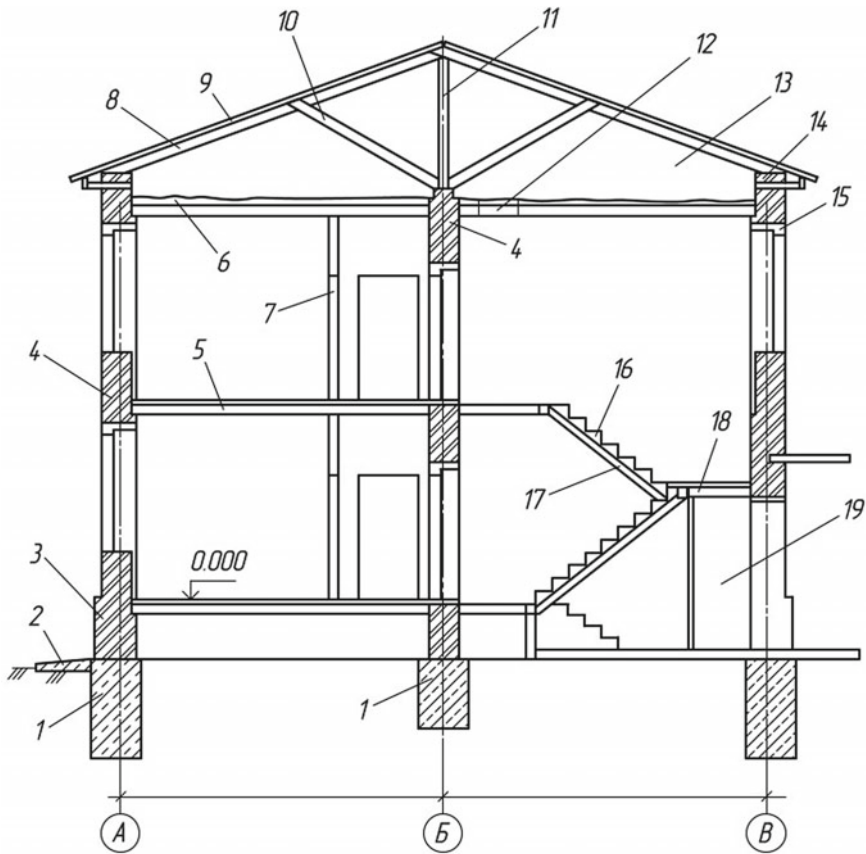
Structural elements of a brick building: 1—foundation; 2—blind area; 3—basement; 4—brick wall; 5—inter-floor; 6—attic floor; 7—partition; 8—wooden rafters; 9—wooden crate; 10—wooden mower; 11—wooden stand; 12—attic hatch; 13—attic; 14—wooden mauerlat; 15—lintel; 16—stairs; 17—kosour; 18—landing; 19—entrance vestibule
